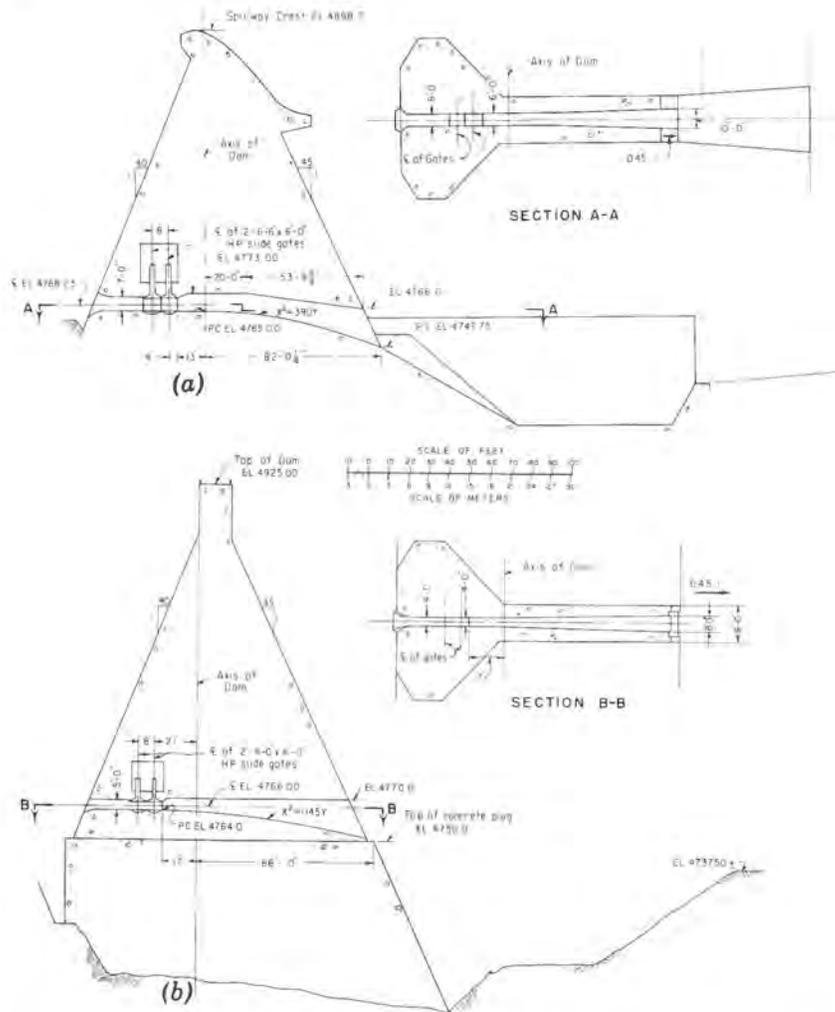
Pueblo Dam Preliminary Outlet Works: (a) Spillway Outlet Works; (b) River Gorge Outlet Works
